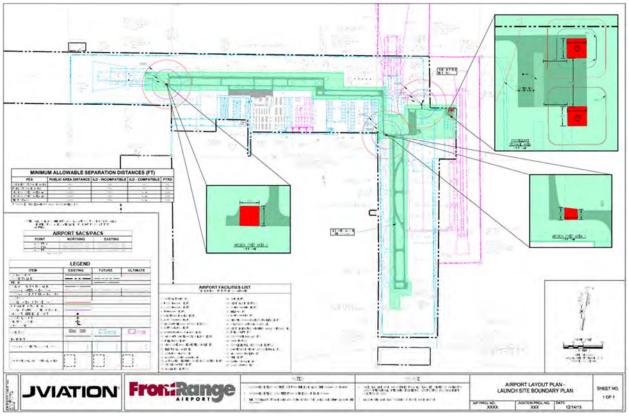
FTG LAUNCH SITE BOUNDARY PLAN
